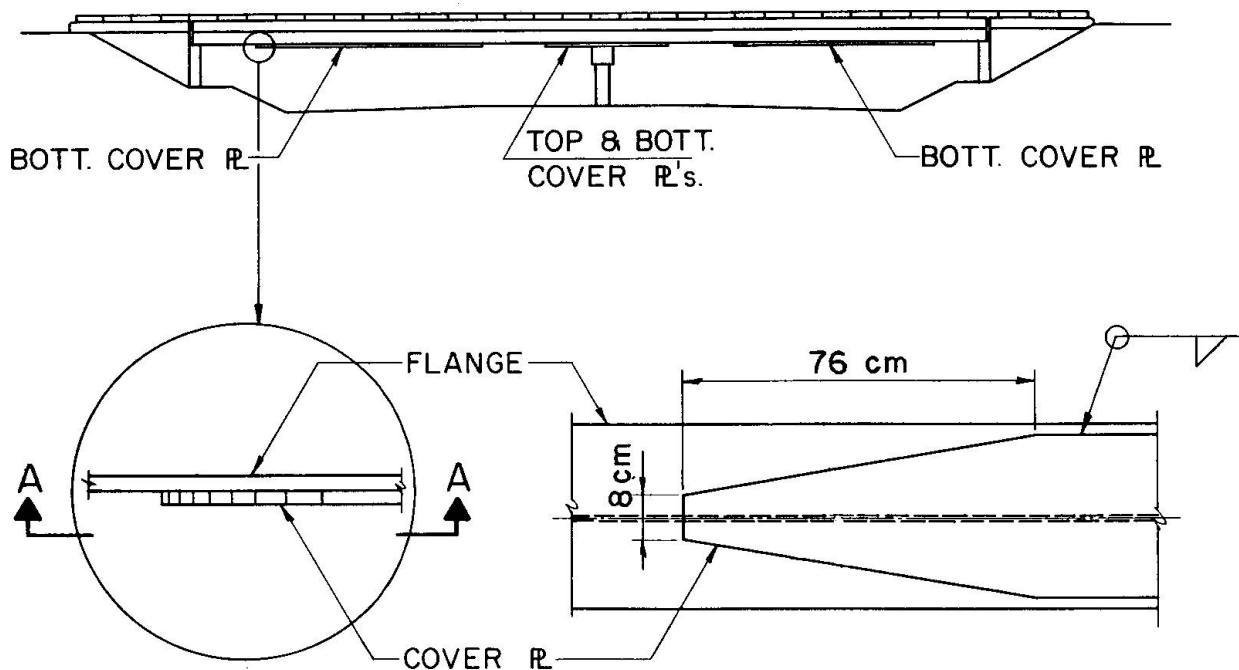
Typical End Detail of Welded Cover Plate
